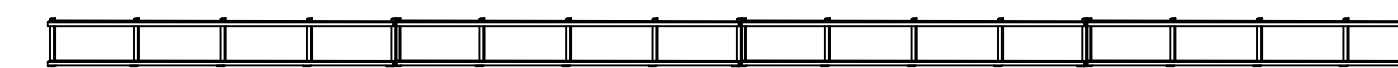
PLACE A ROW OF CONSTRUCTION FORMS ALONG DESIRED CHANNEL ALIGNMENT FOR FIRST FES LIFT.
